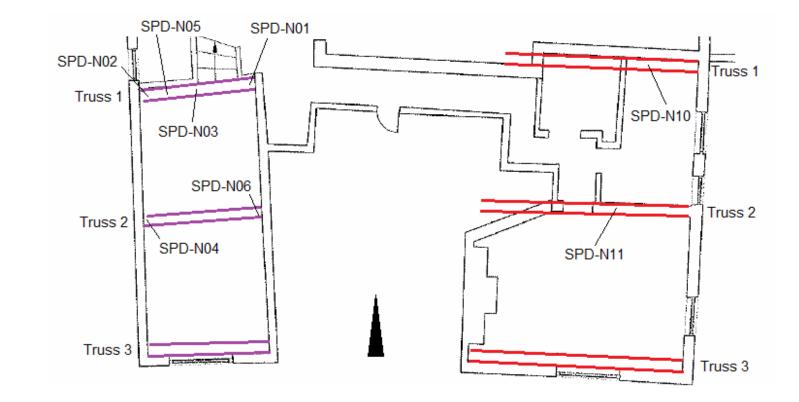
First-floor plan, showing the approximate truss positions and the location of samples SPD-N01–06 and SPD-N10–11 (after Butler Hegarty Architects)
